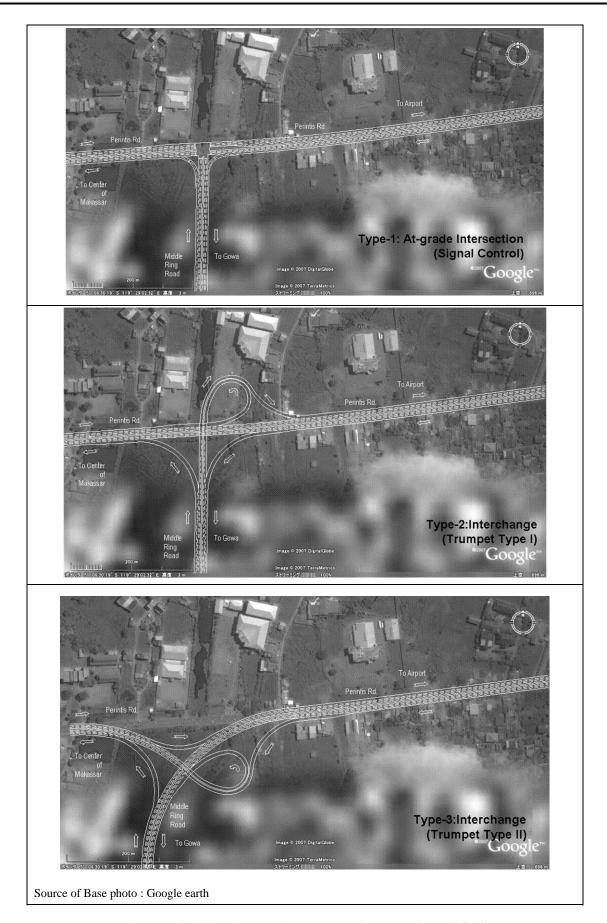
(2) Alternative Intersection Plan for TS-5 IC
